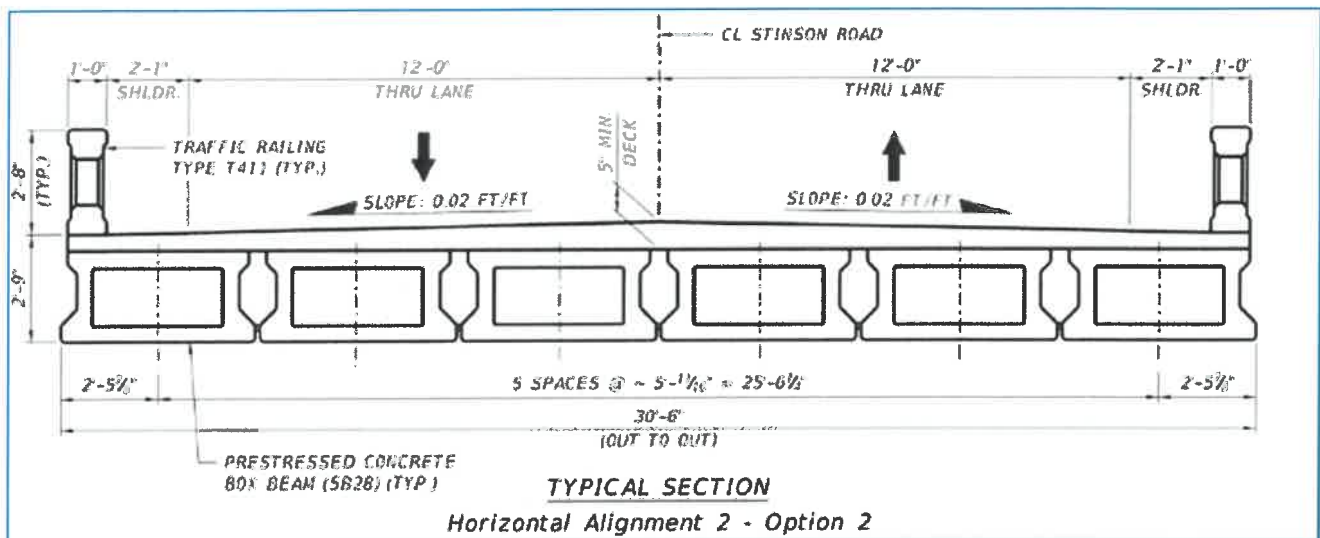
TxDOT Prestressed Concrete Box Beams (5B28) Typical Section
